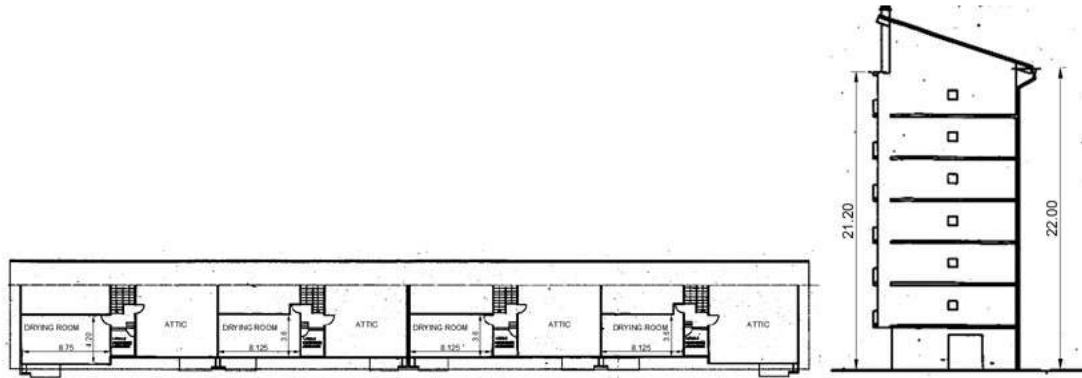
Attic Floor plan and east/west elevation with the indication of the heights.
